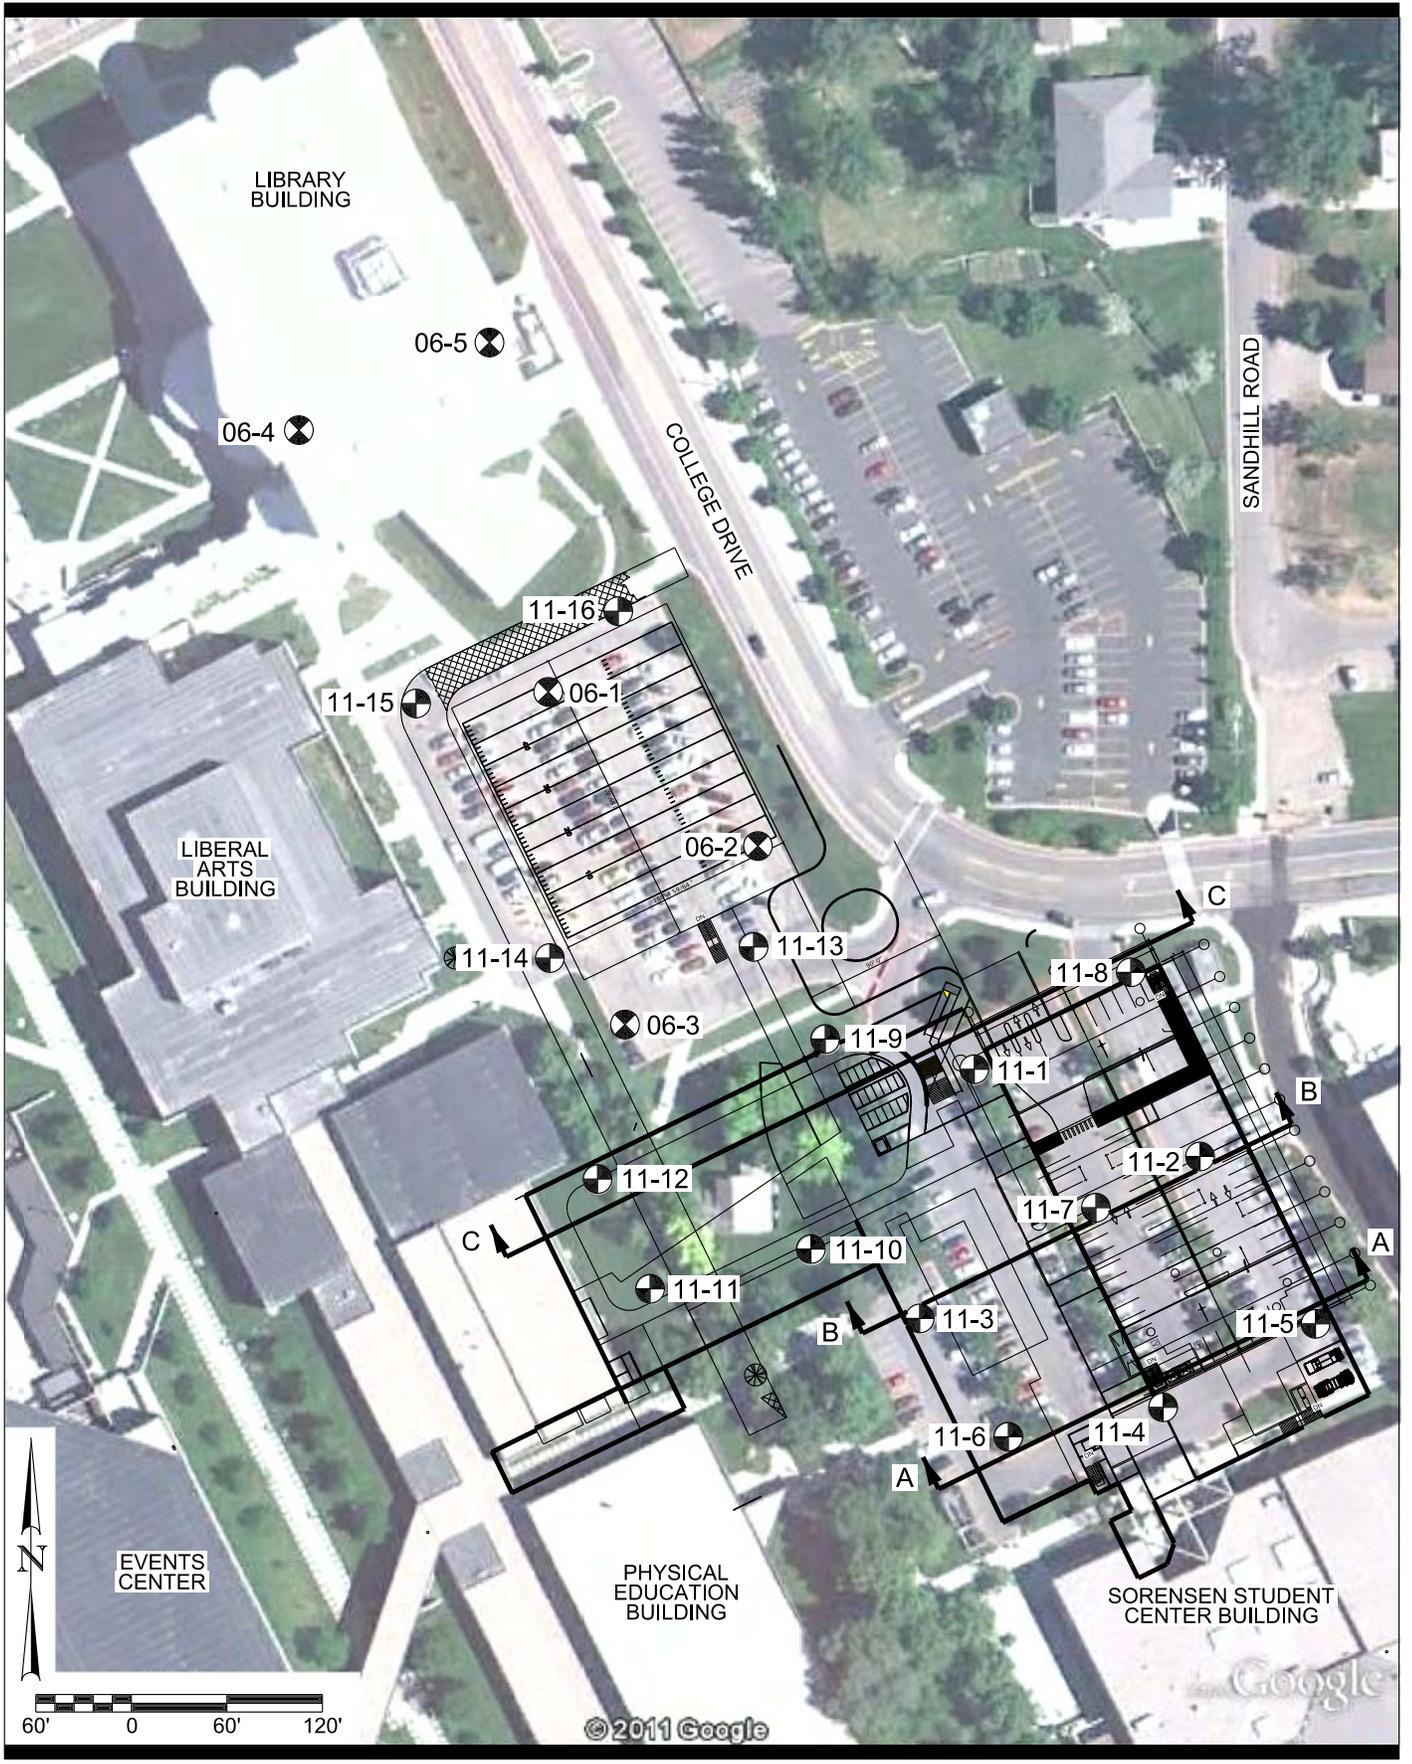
SITE PLAN & TEST HOLE LOCATIONS
